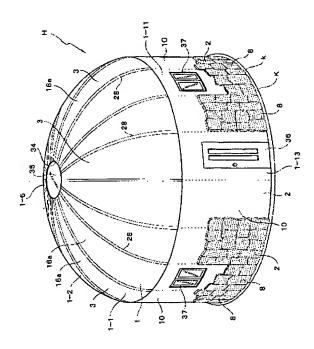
The perspective view explaining the assembly procedure of an assembly house.
